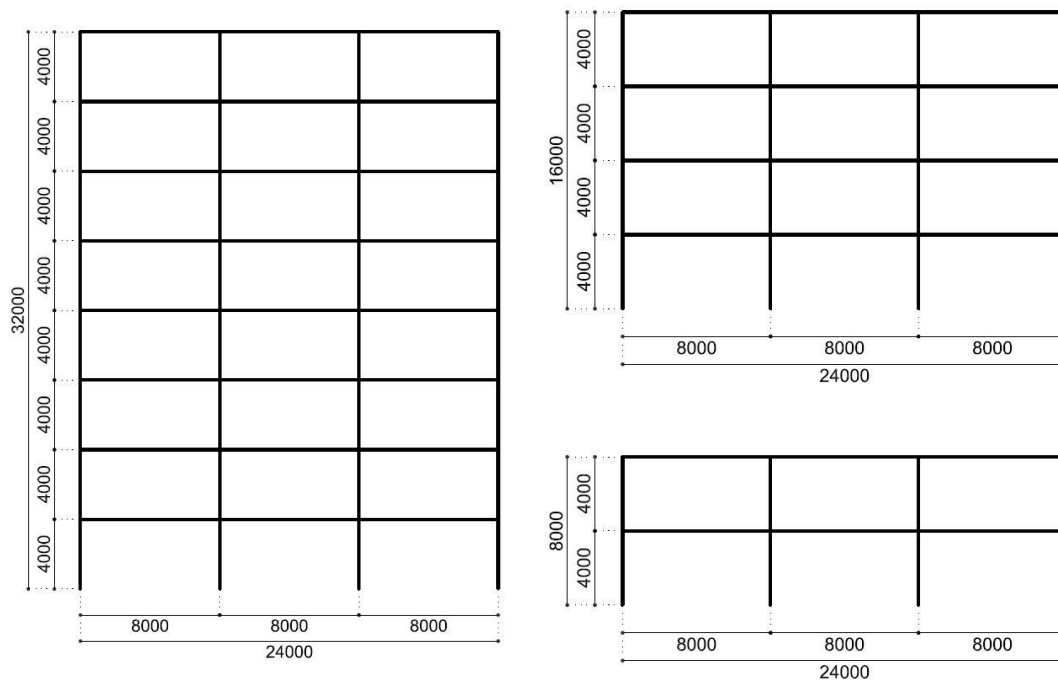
Elevation View of the 2/4/8-Story Archetype Structures
